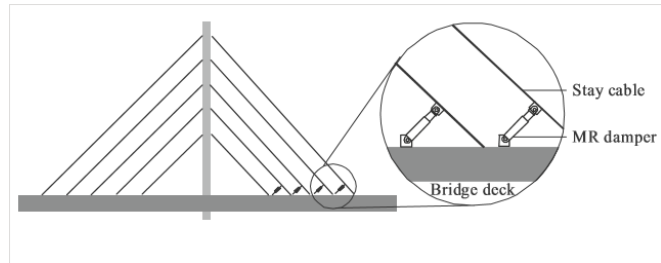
MR damper being used in cables of suspension bridges [12]
